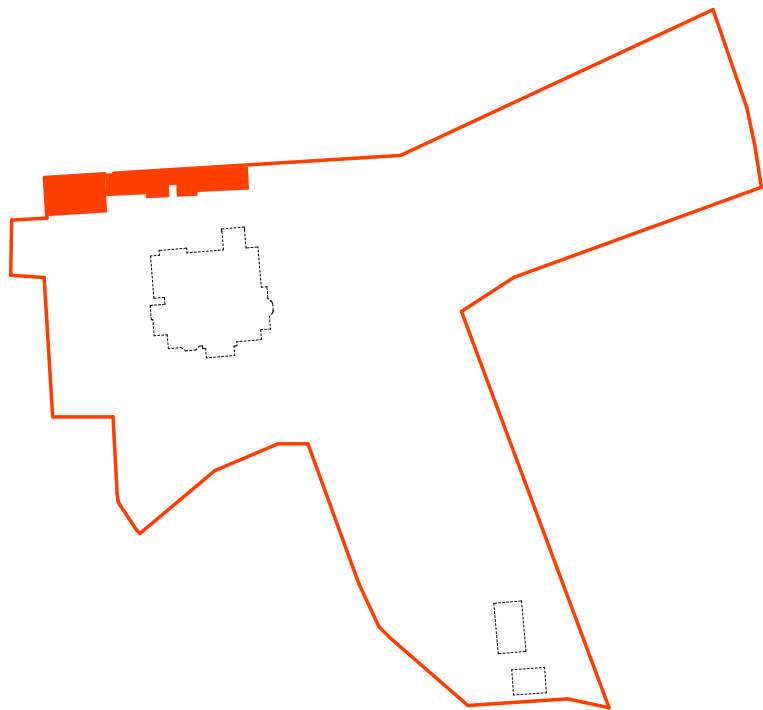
Site Diagram Depicting Site Boundary & Existing Out Buildings
